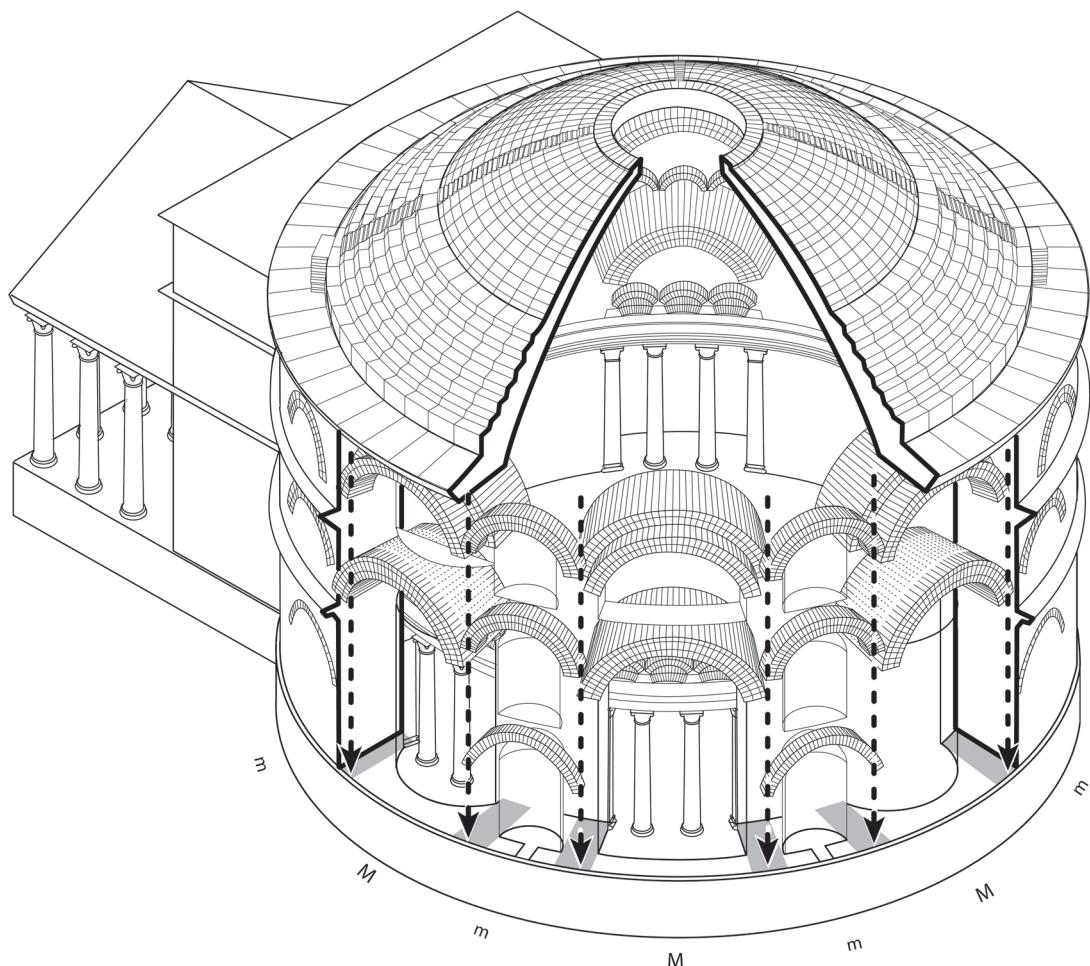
Pantheon. Drawing of structural system of arches/ ribs in rotunda wall.
